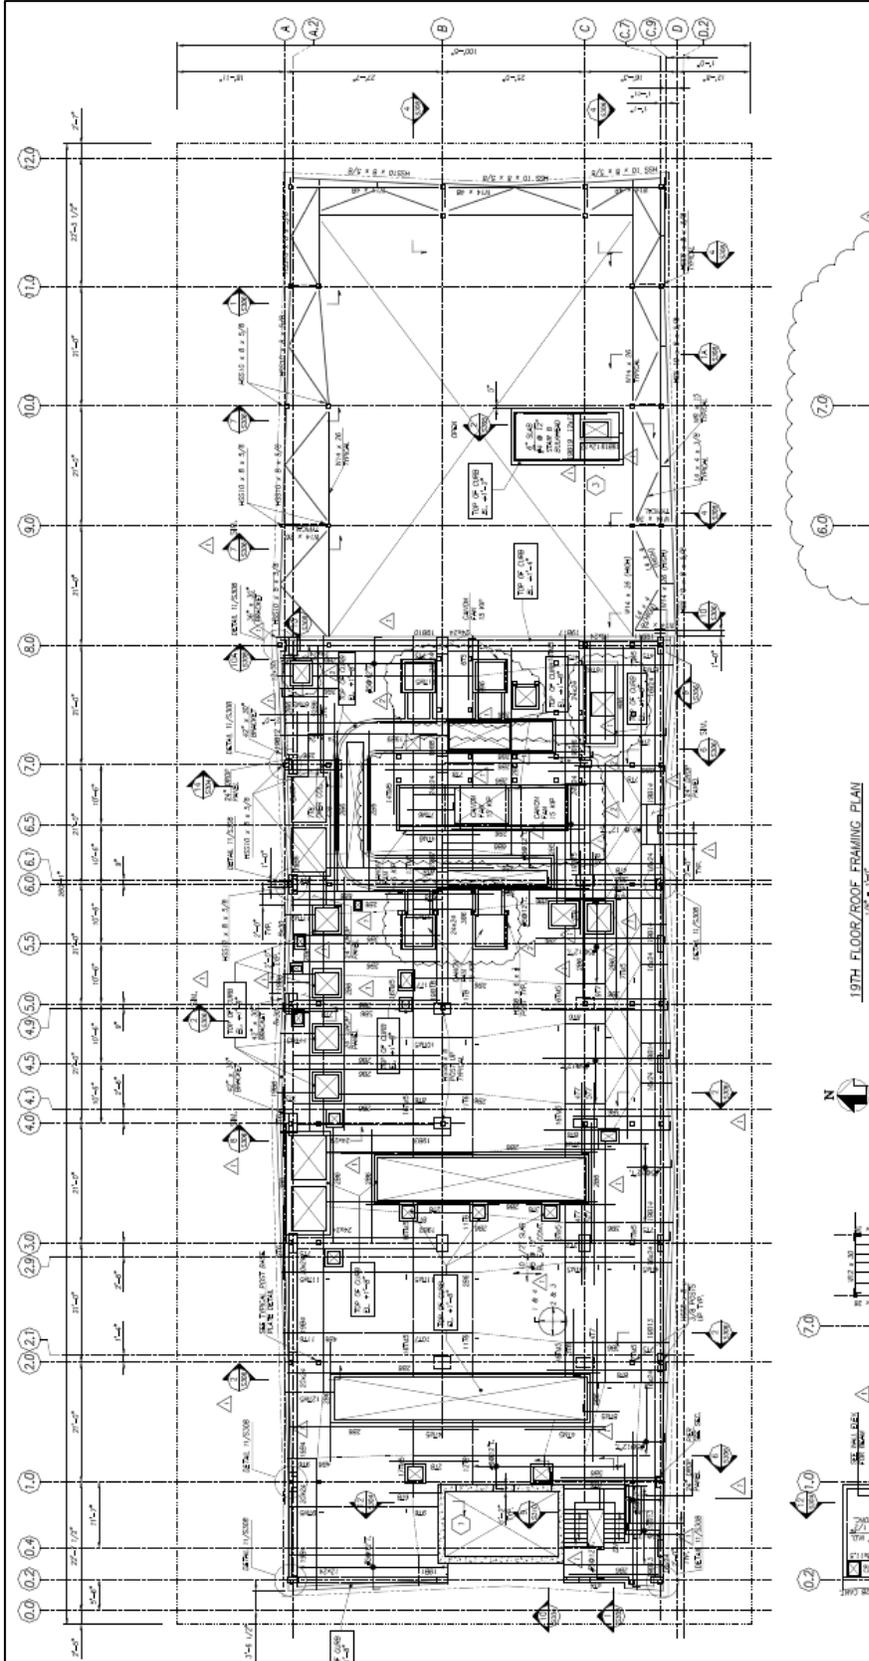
19<sup>th</sup> Floor/Roof Framing Plan
